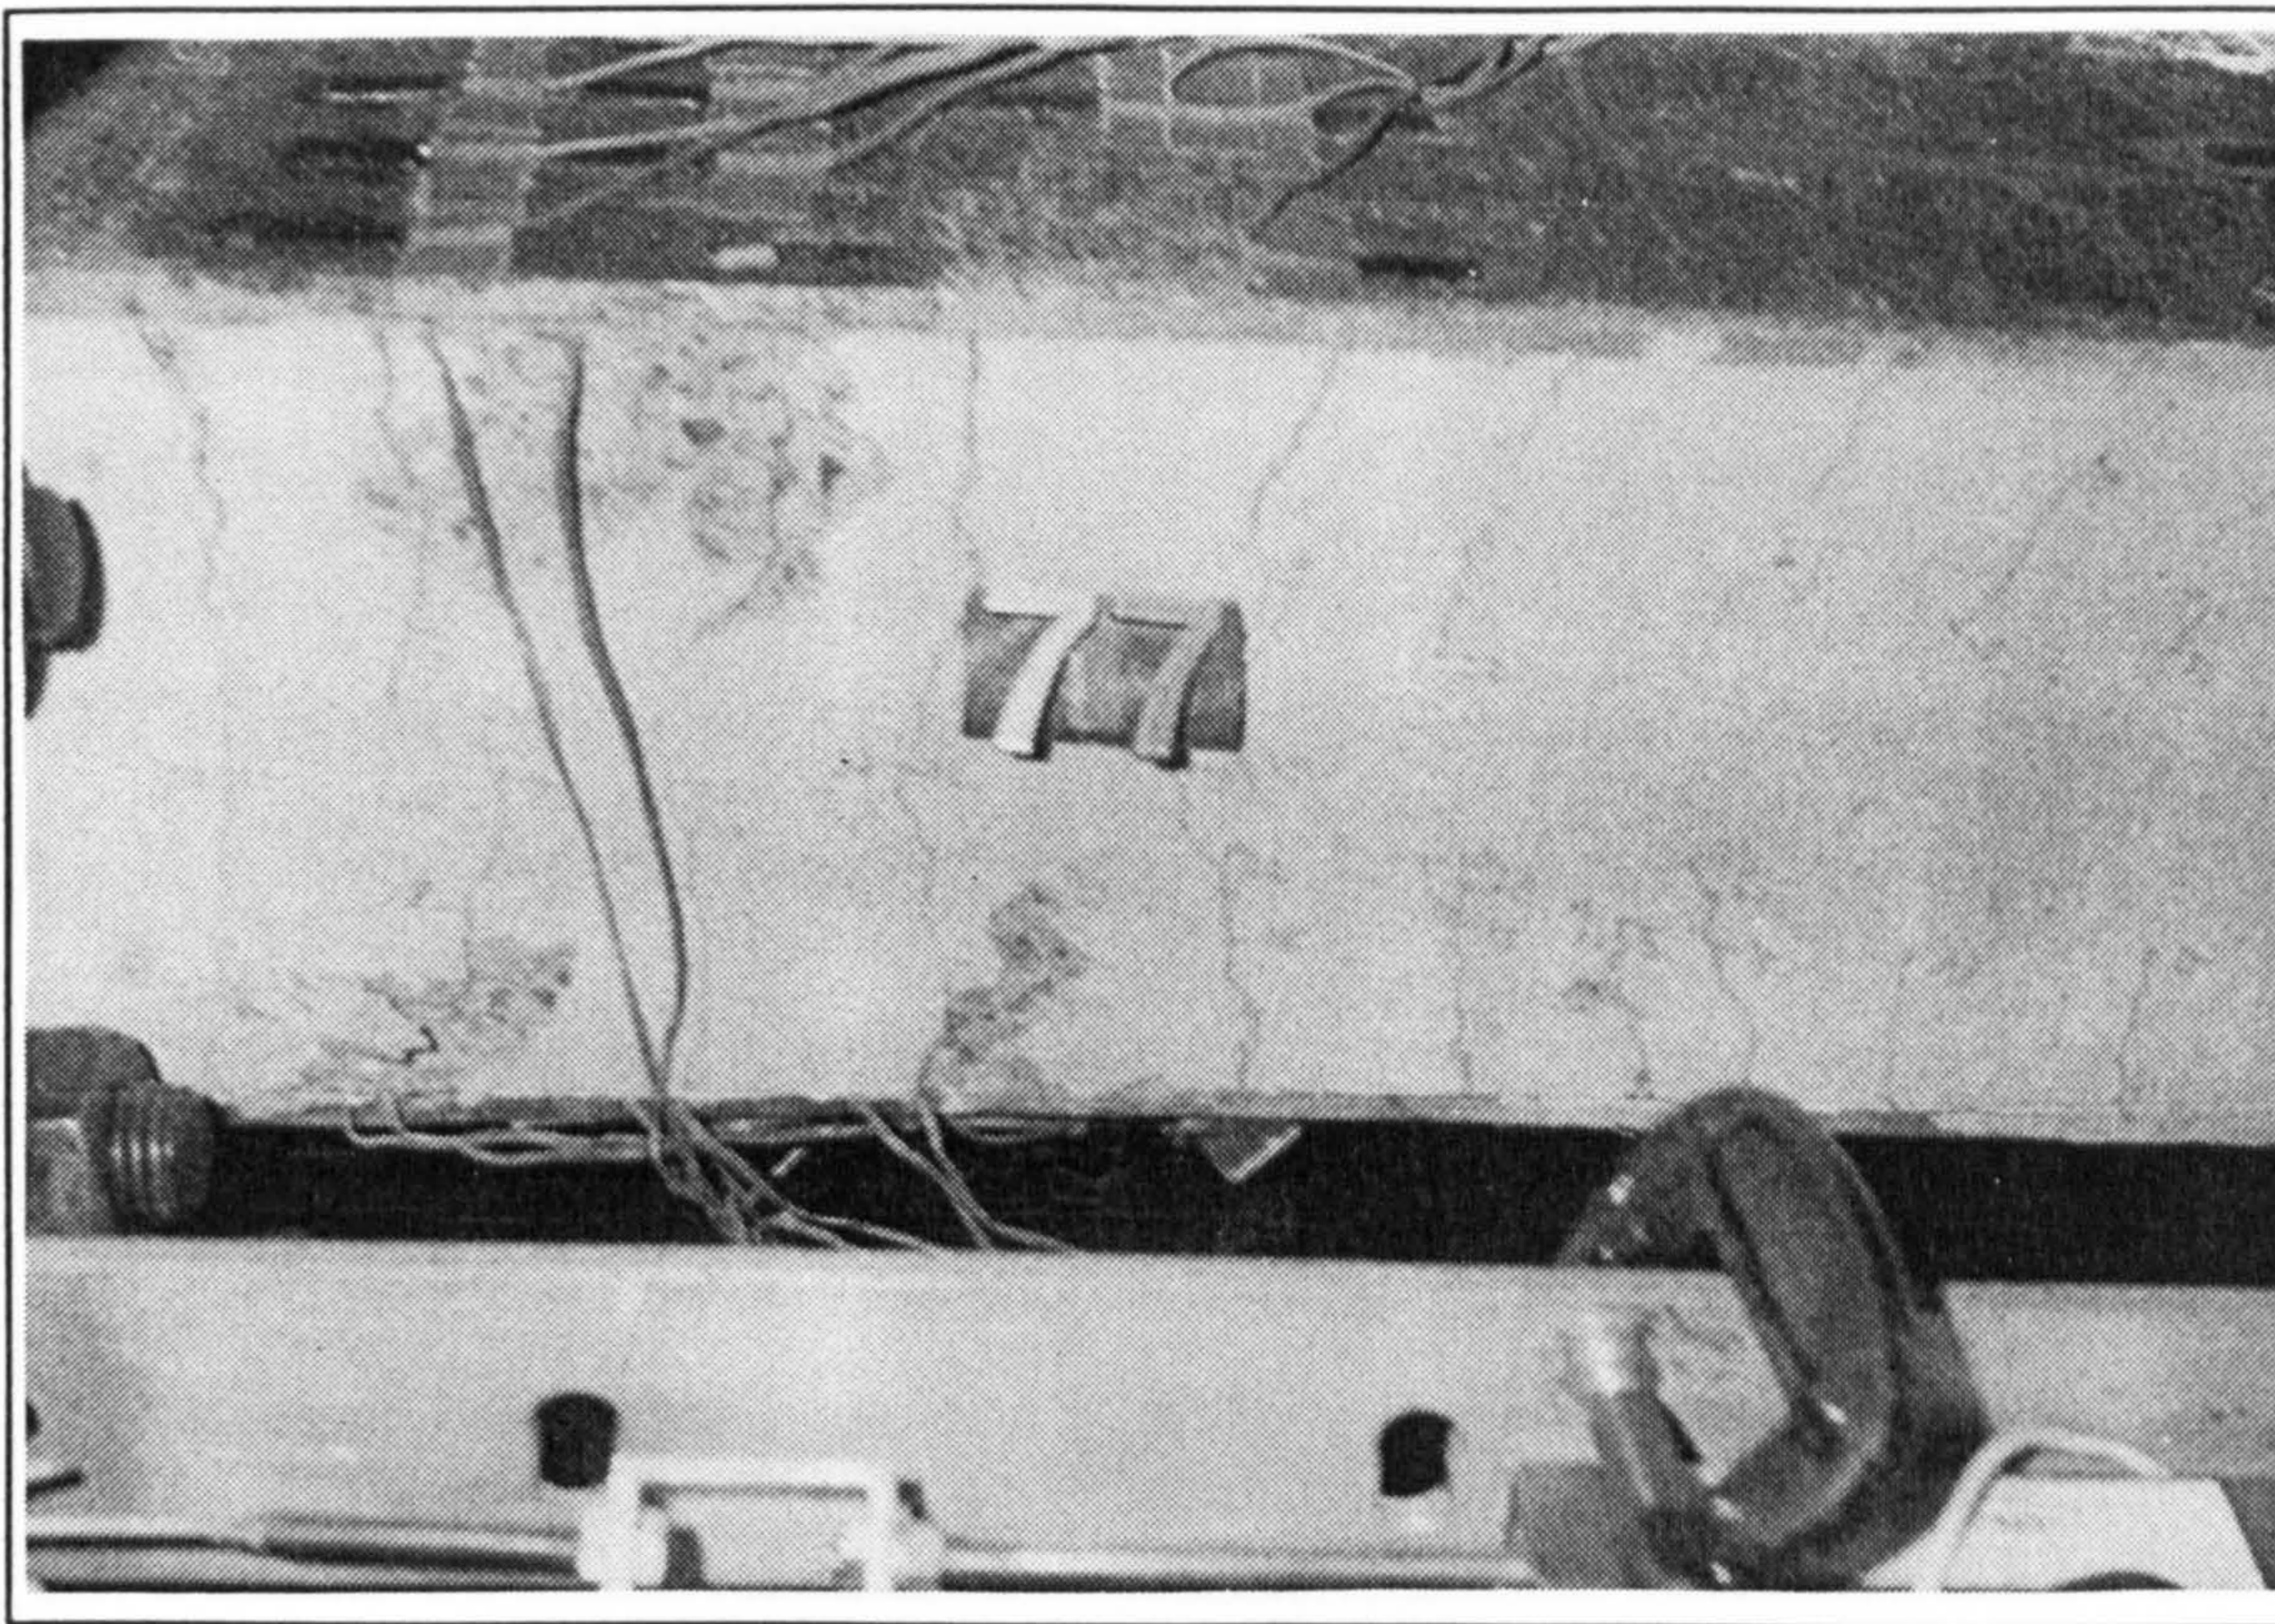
IC01 at 77 mm, concrete cracks and spalling of cover concrete
